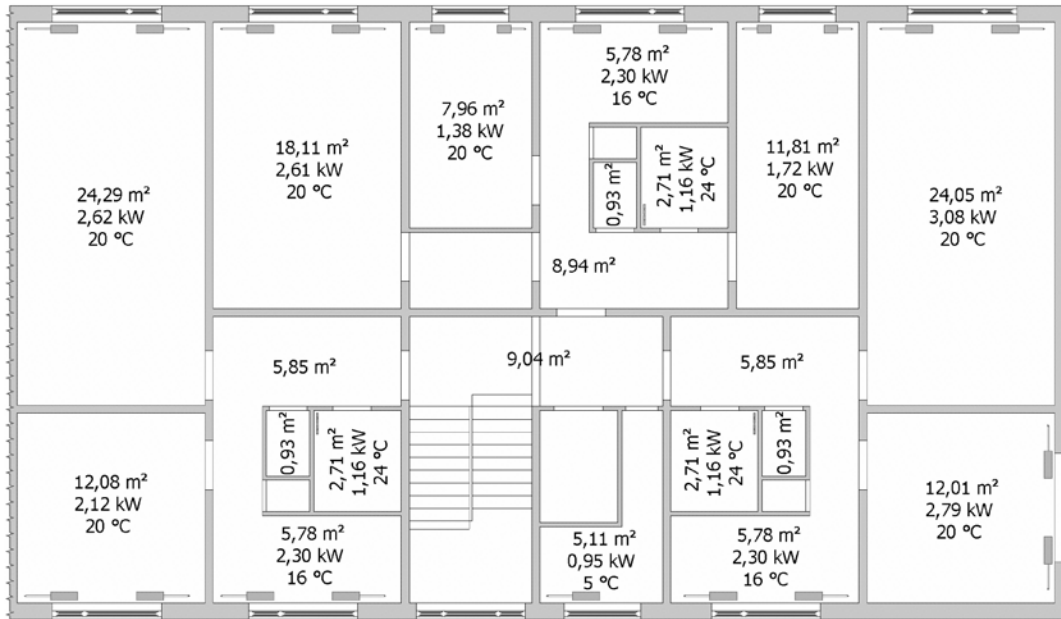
Designed heating power and flats' layout, one half of the SOLANOVA building.
